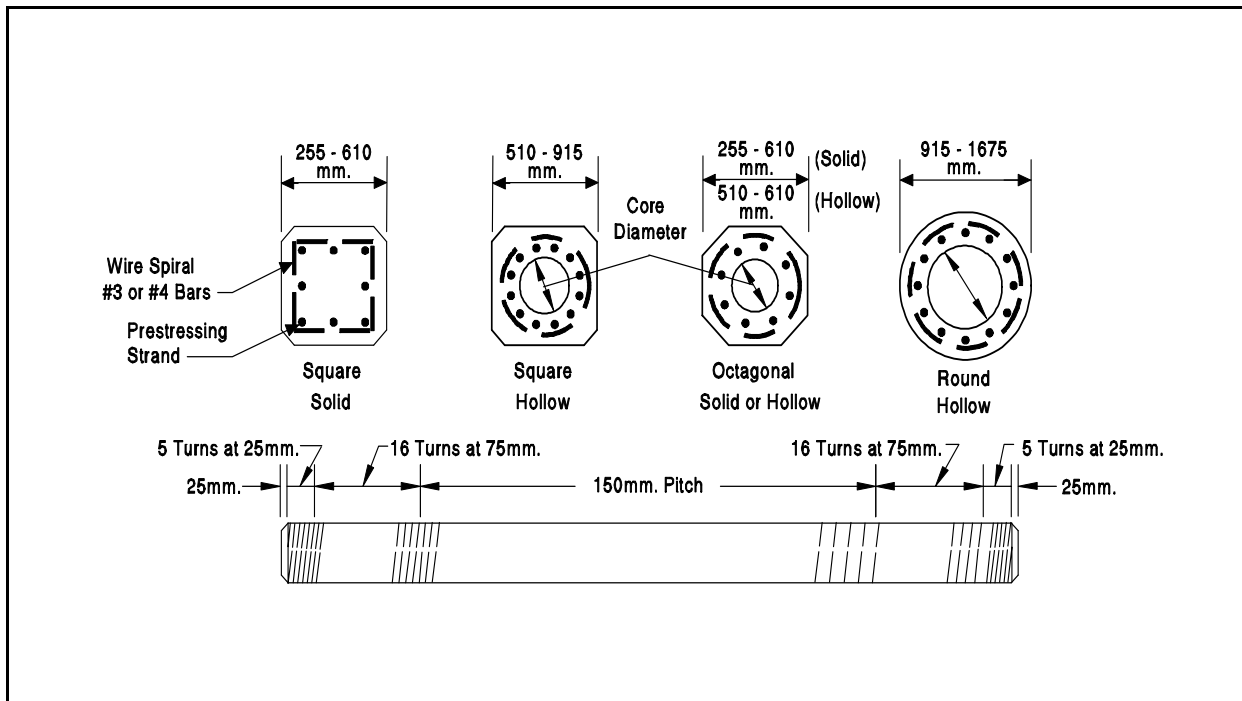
Typical Prestressed Concrete Piles (after PCI, 1993)
